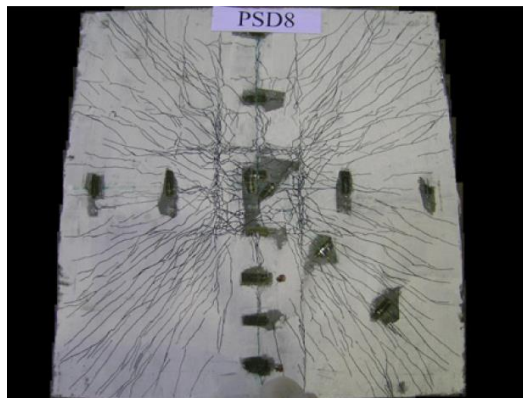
Typical Cracking pattern in ECC retrofit of Masonry panel (Maalej et al., 2010)
